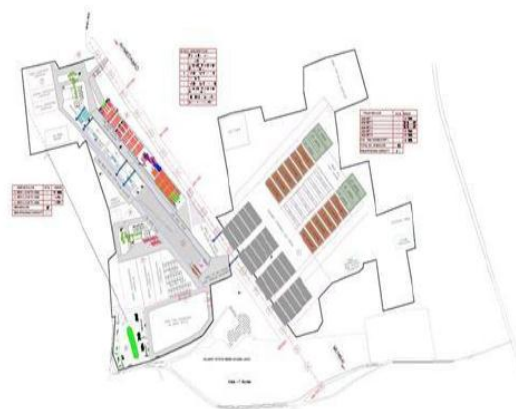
Typical Layout Plan Showing facilities in Pre-Cast Yard
